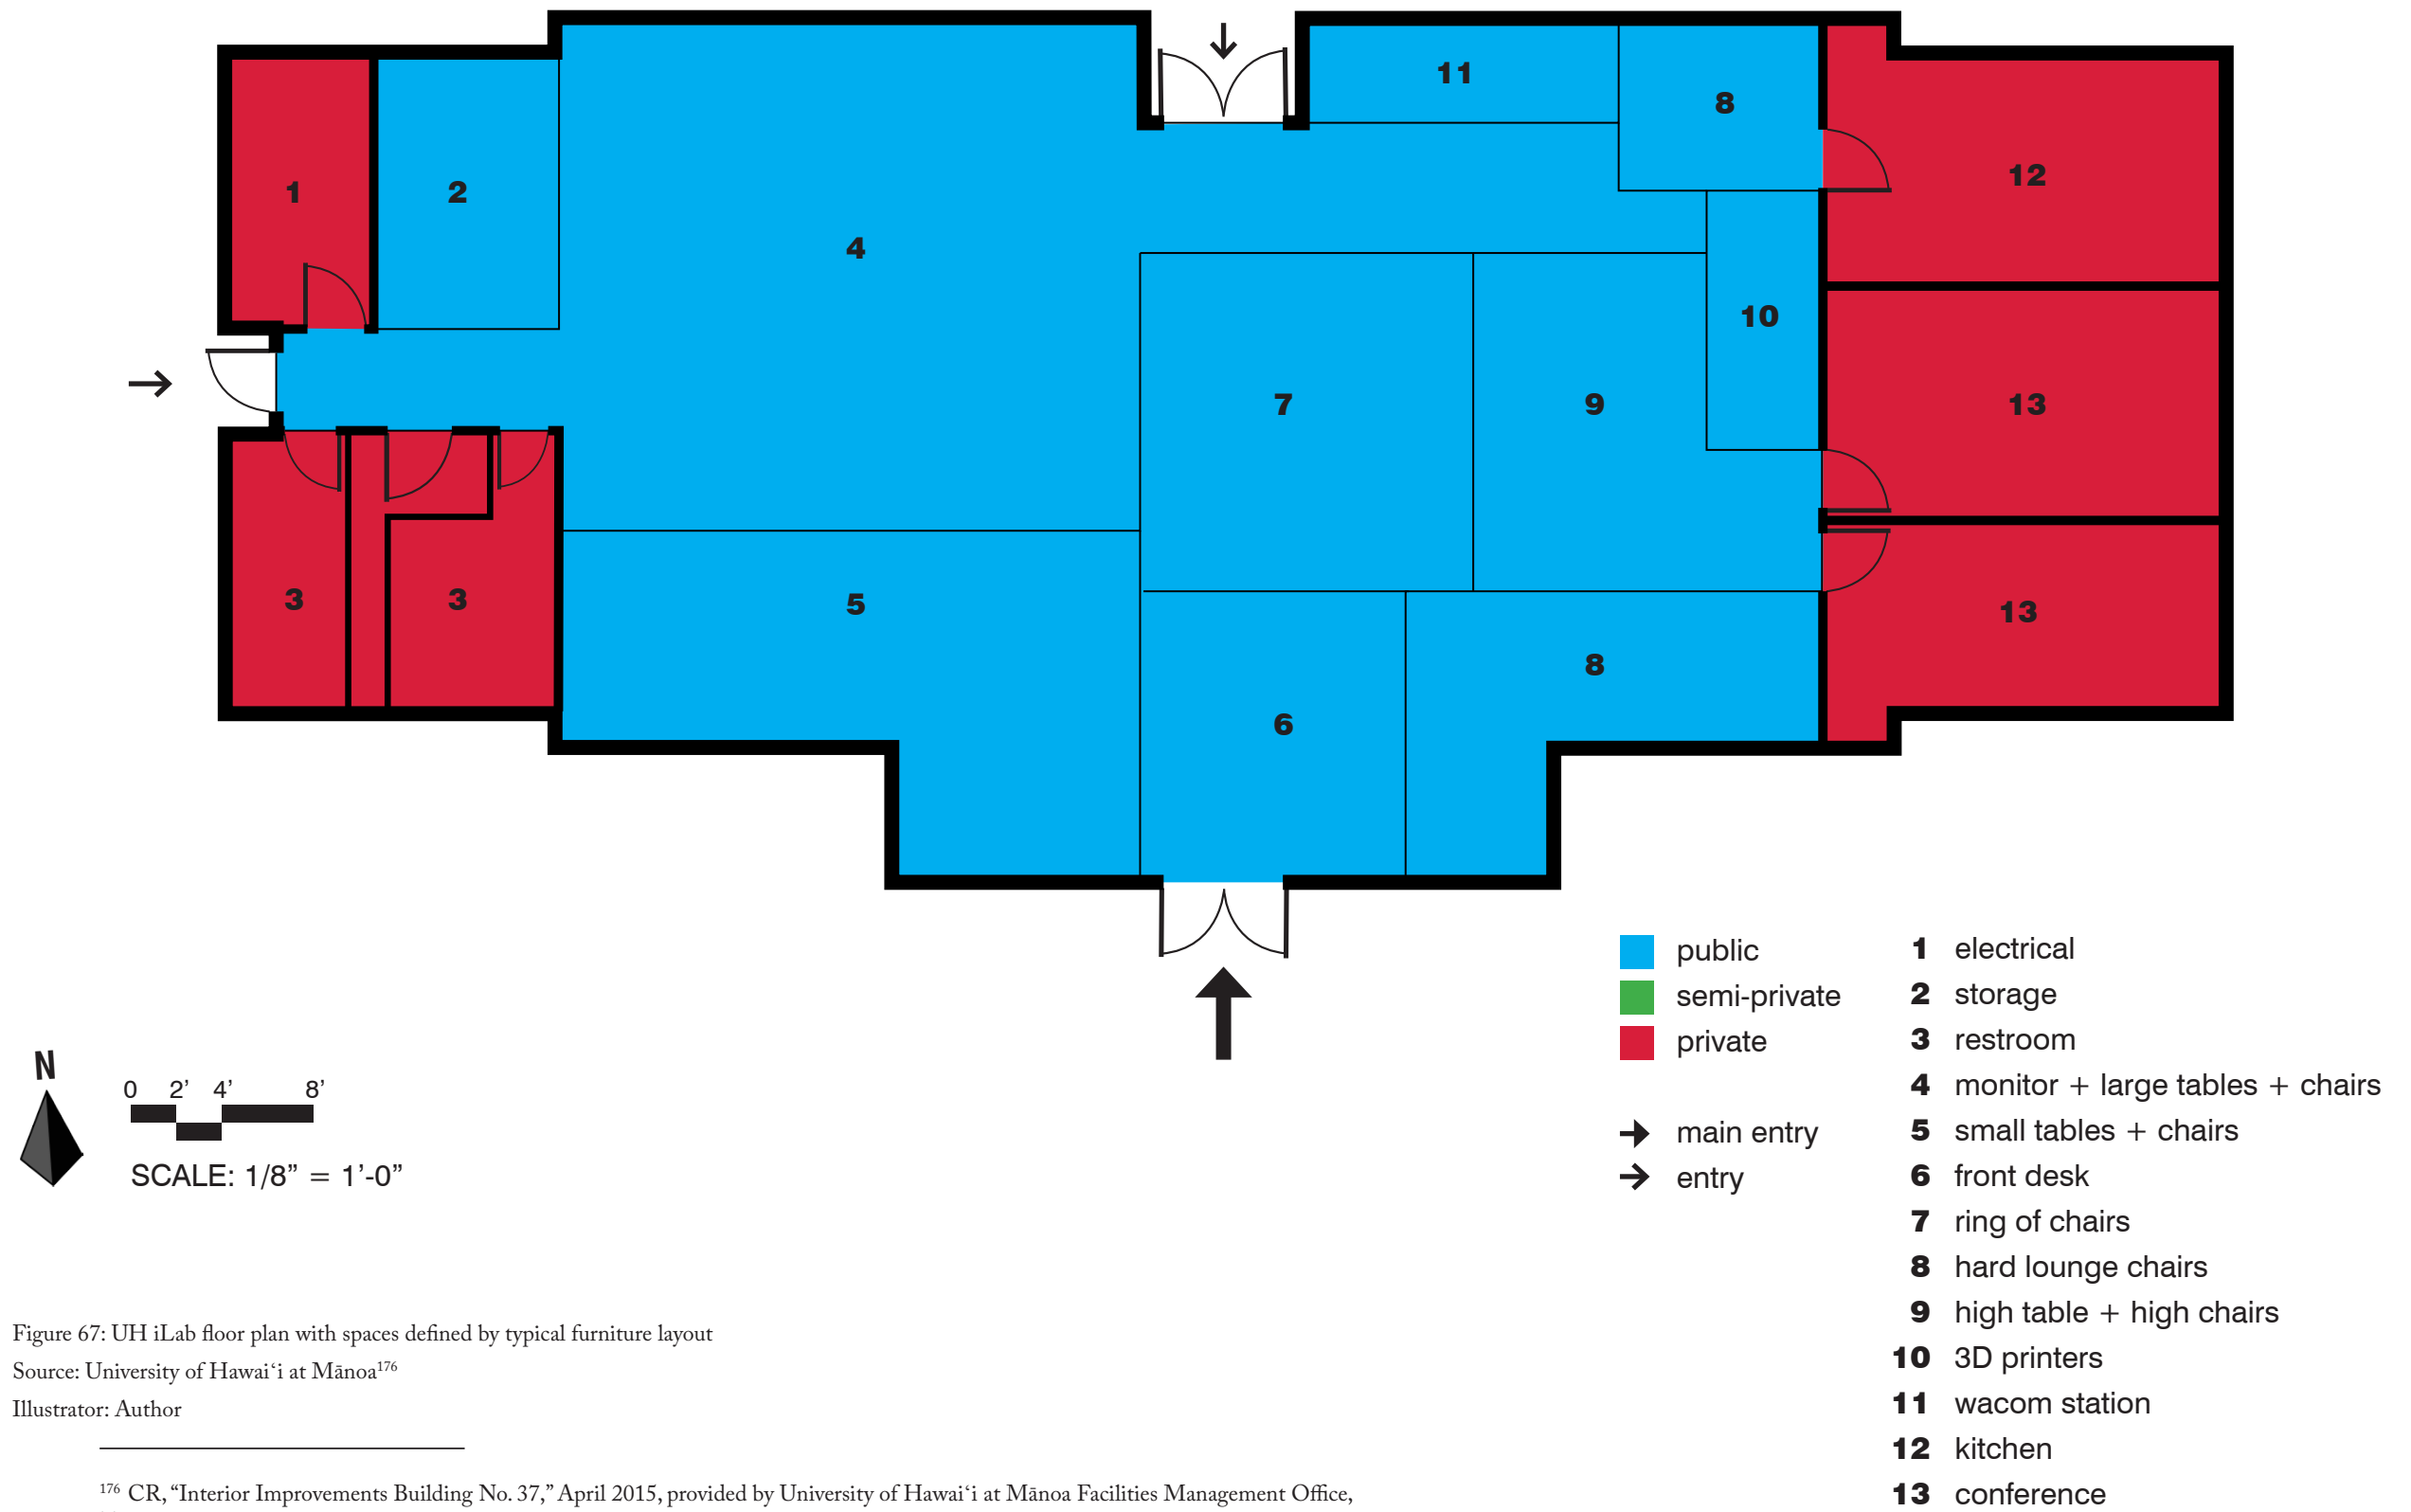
UH iLab floor plan with spaces defined by typical furniture layout
